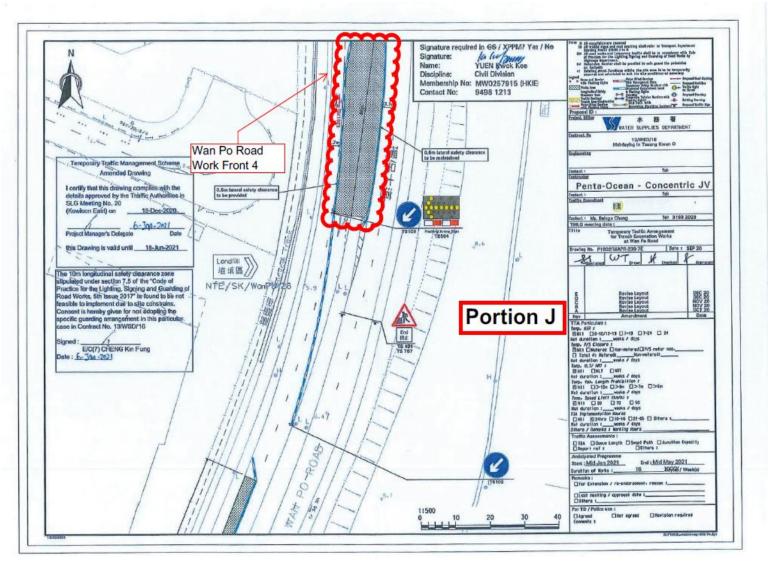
Location Plan for Portion J – Wan Po Road 4
